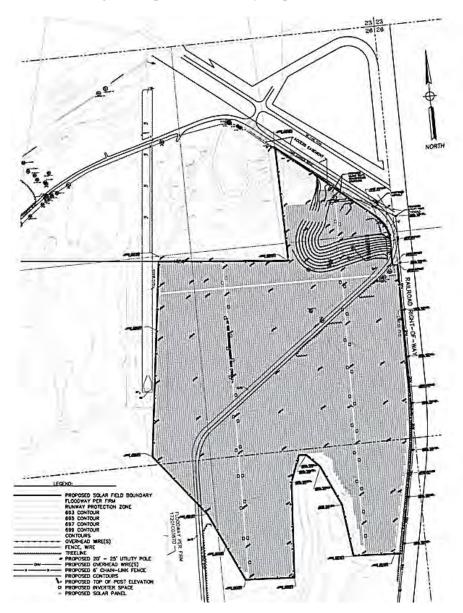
Proposed Solar Farm Site Plan (See Appendix D, for high resolution image)
